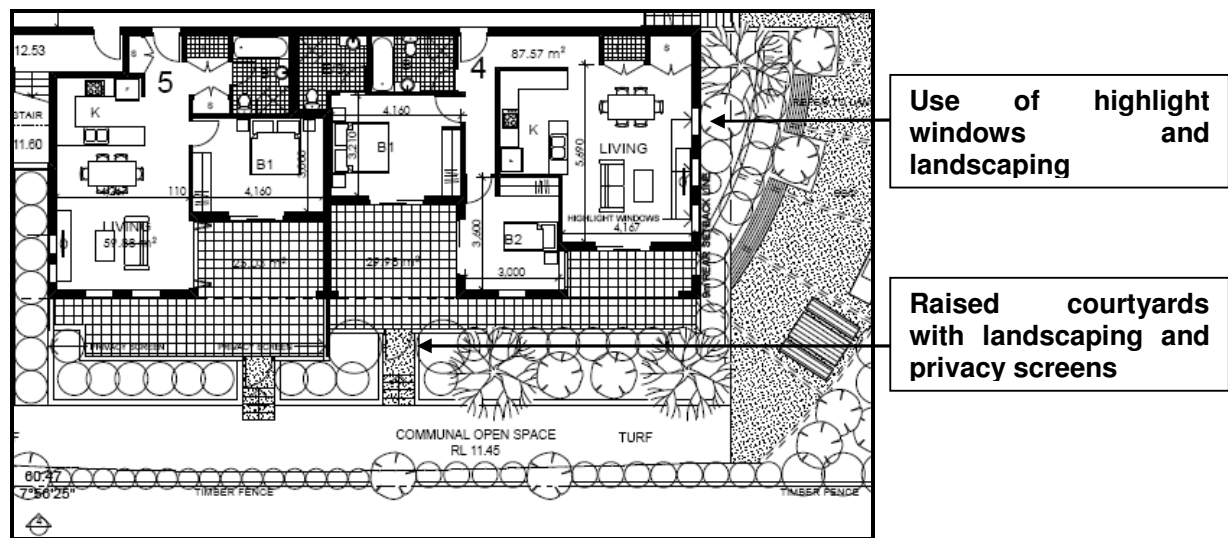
Extract of Ground floor plan (adjacent eastern boundary)
